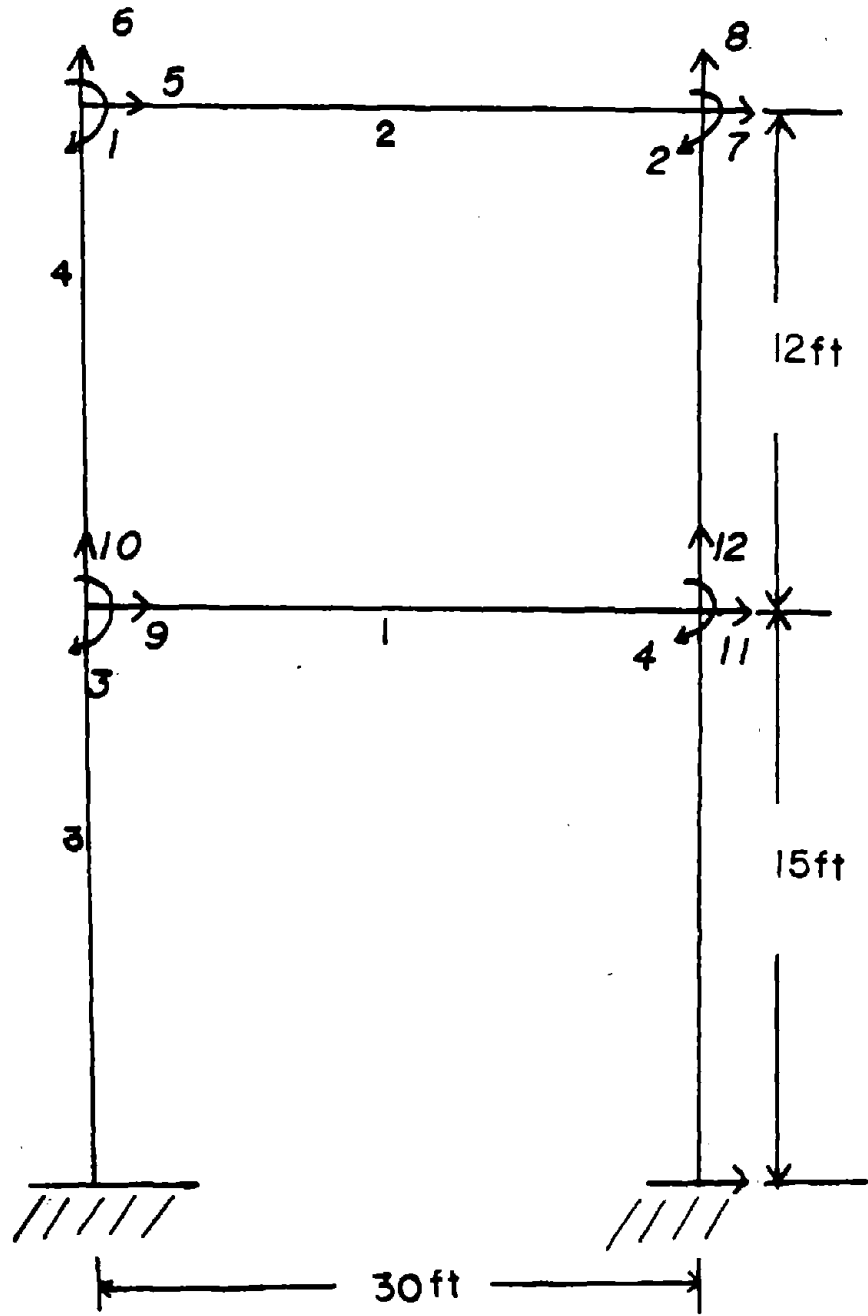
Two Story Building Structure (1 ft = 30.48 cm)
